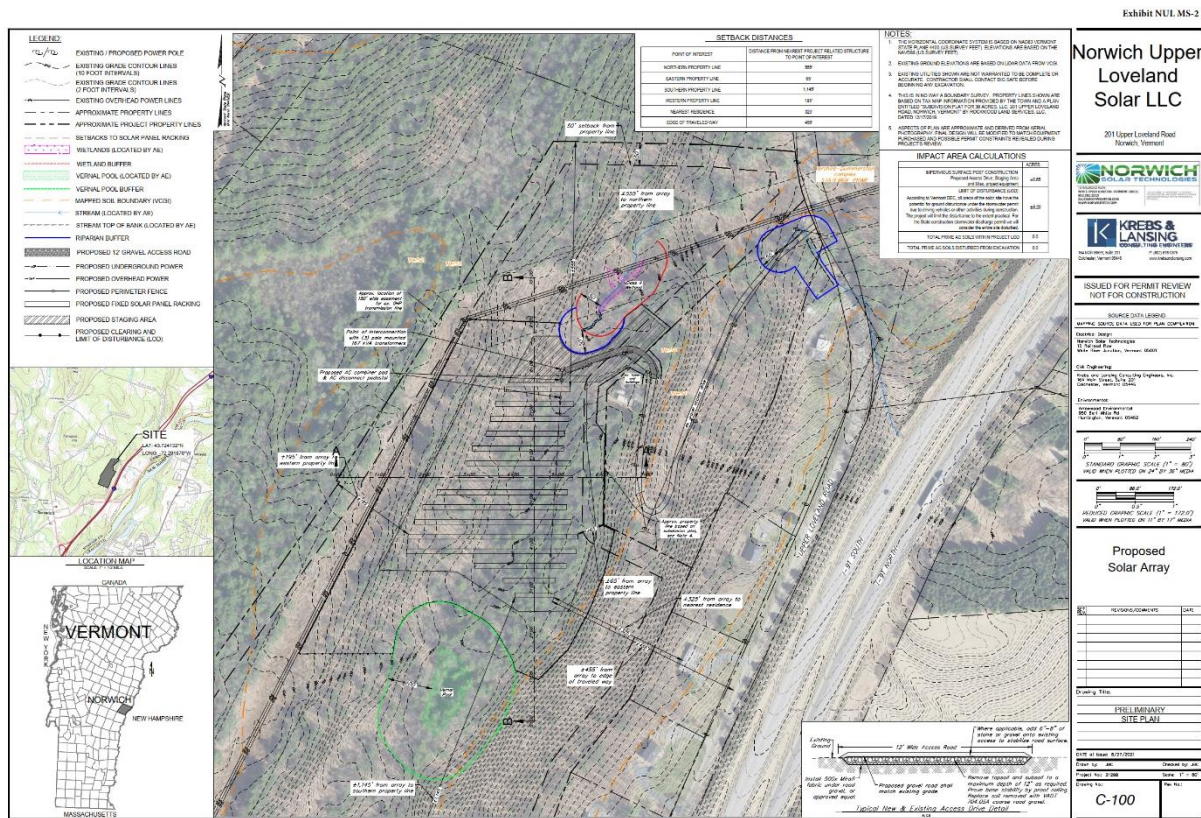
Exhibit NUL MS-2, C-100 Site Plan retrieved from the ePUC website
